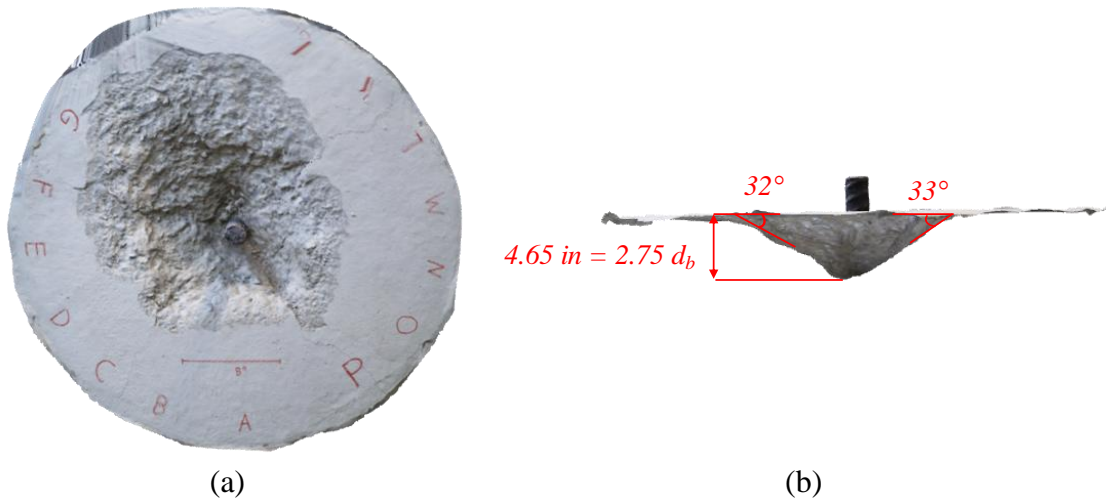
3D Point Cloud Model of Fracture Surface of Test Specimen #2: (a) Plan View; (b) Cone Shaped Fracture
